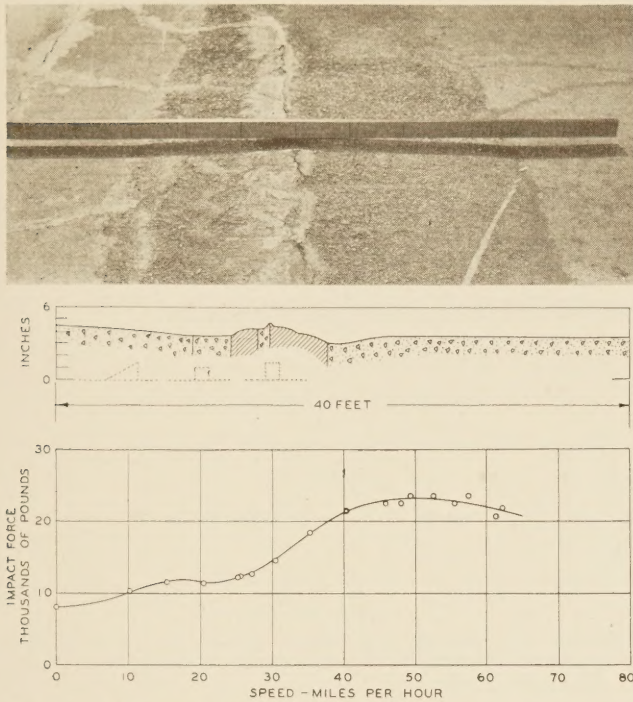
IMPACT REACTIONS PRODUCED ON A CONCRETE PAVEMENT AT A HEAVED JOINT
